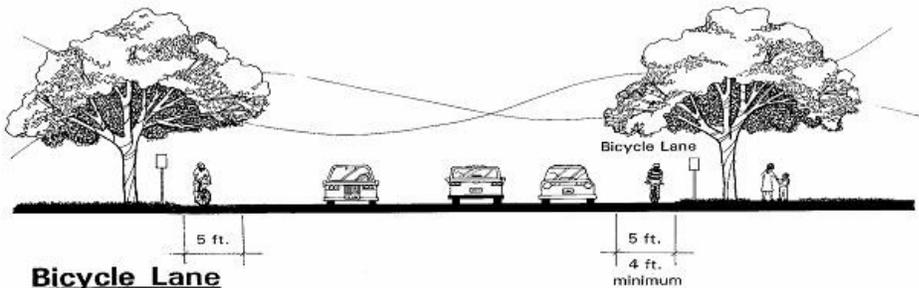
, Alternative Cross Sections for Bicycle Facilities
